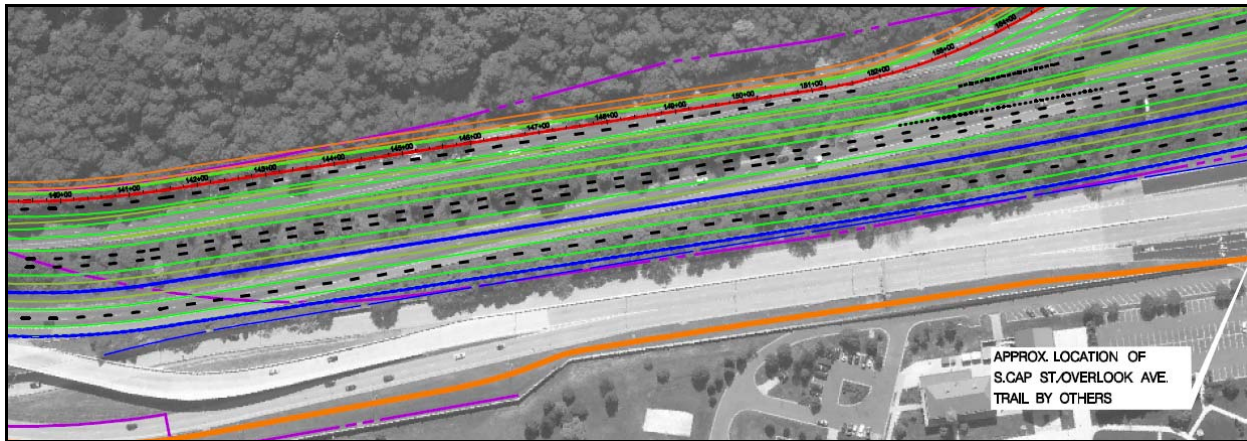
Realignment Alternative Considered but Eliminated from Detailed Study that Involved Shifting I-295 to the West and Routing the West Campus Access Road on the Original I-295 Corridor
